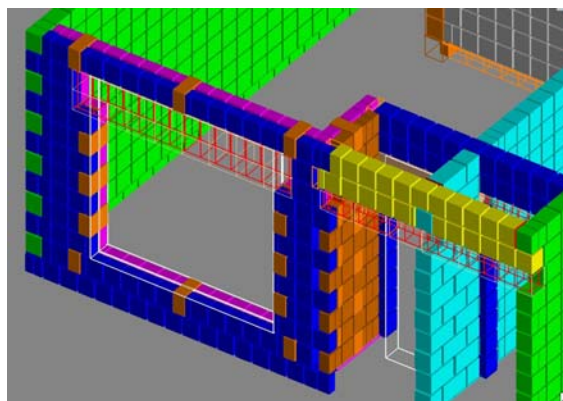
Image indicating bearing of reinforced concrete lintels on supporting wall and the modelling of bonded double leaf walls in jambs of openings.
